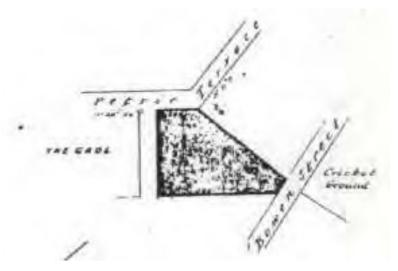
Early plan for the proposed Military Barracks showing old Gaol site, Brisbane (Department of Housing and Construction (nd) via NAA 1582131)
